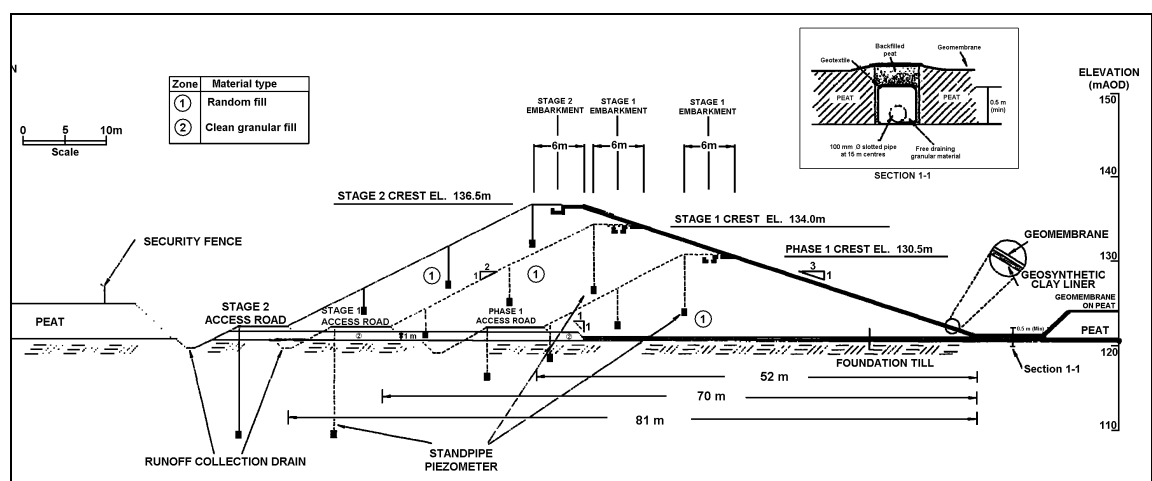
Cross-sectional view of dam at Lisheen TMF. Pond is to the right of the dam [75, Minorco Lisheen/Ivornia West, 1995]
